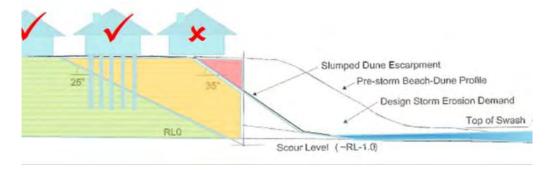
Using Foundation Piles to access the Stable Foundation Zone
